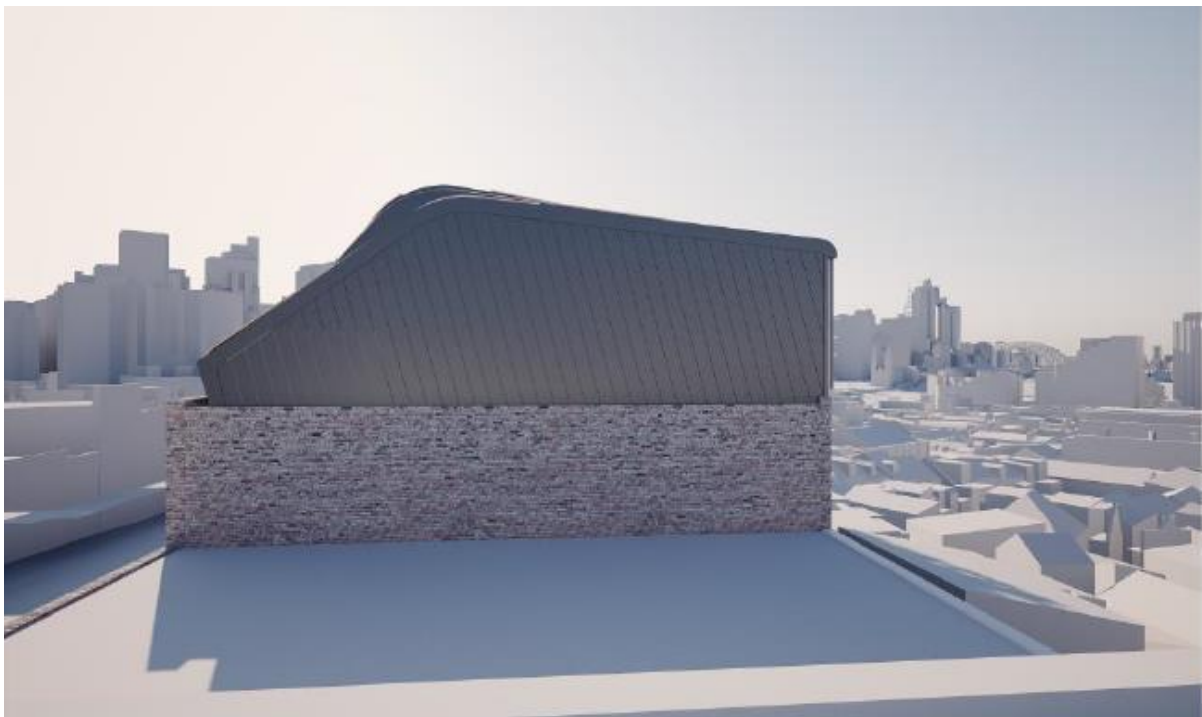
Modelling from applicant's view loss study, as viewed from roof terrace of 130-132 Oxford Street
